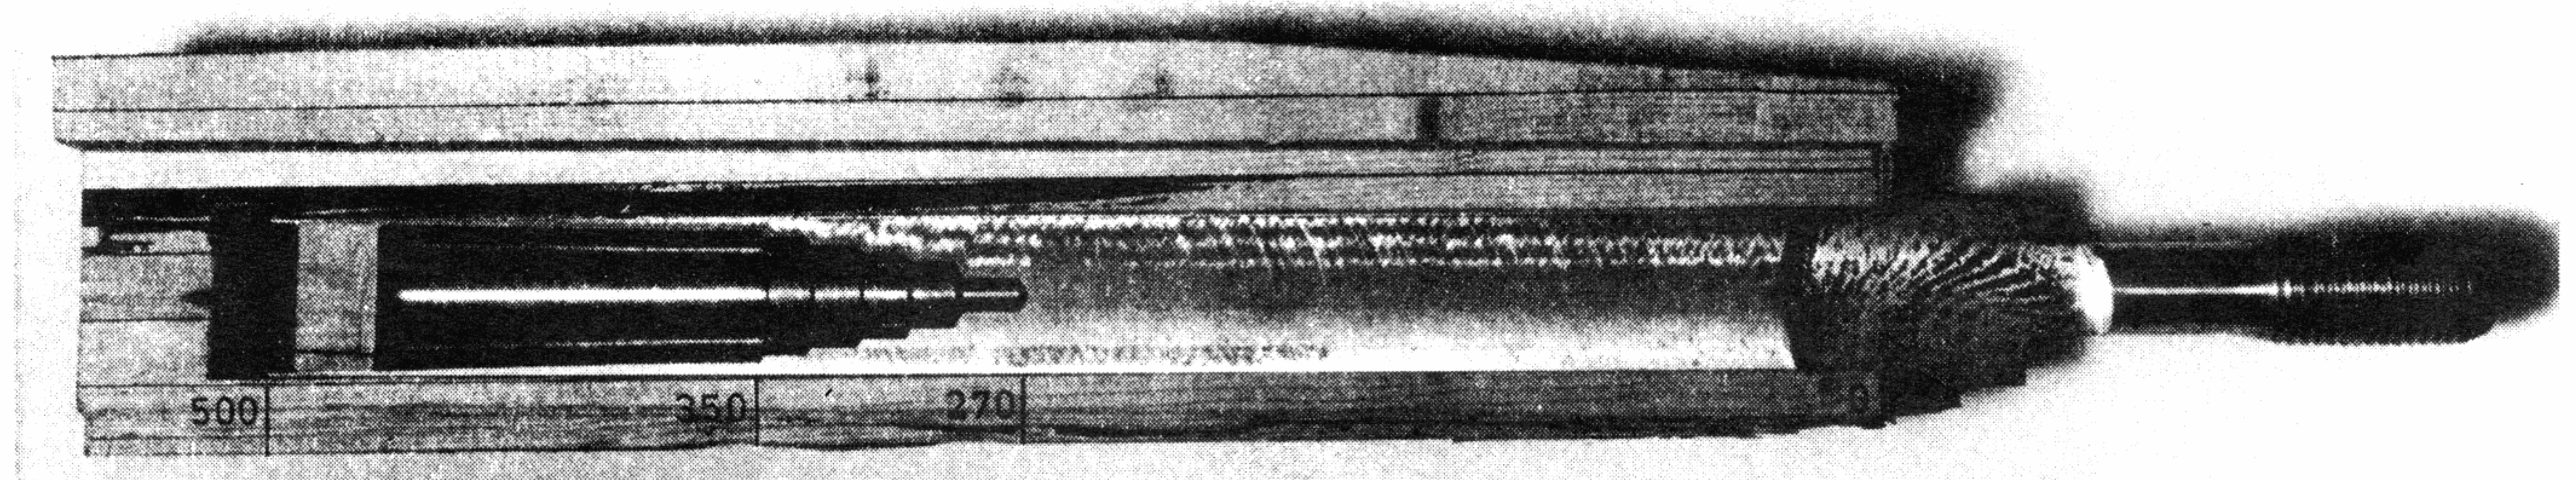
Sectional View of Hollow Tapered Bolt (Measures in mm)
